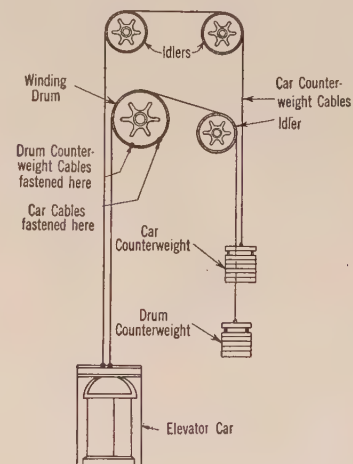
TYPICAL ROPING FOR OVERHEAD DRUM-TYPE ELEVATOR
